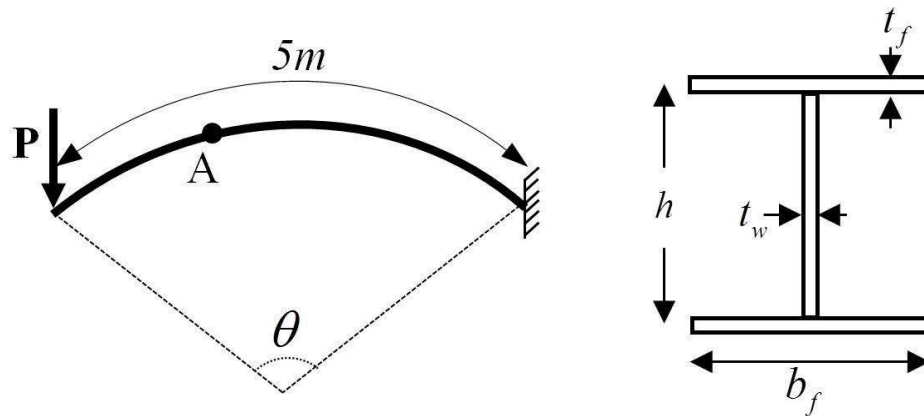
Schematic of cross-section, loading and boundary conditions for example 2
